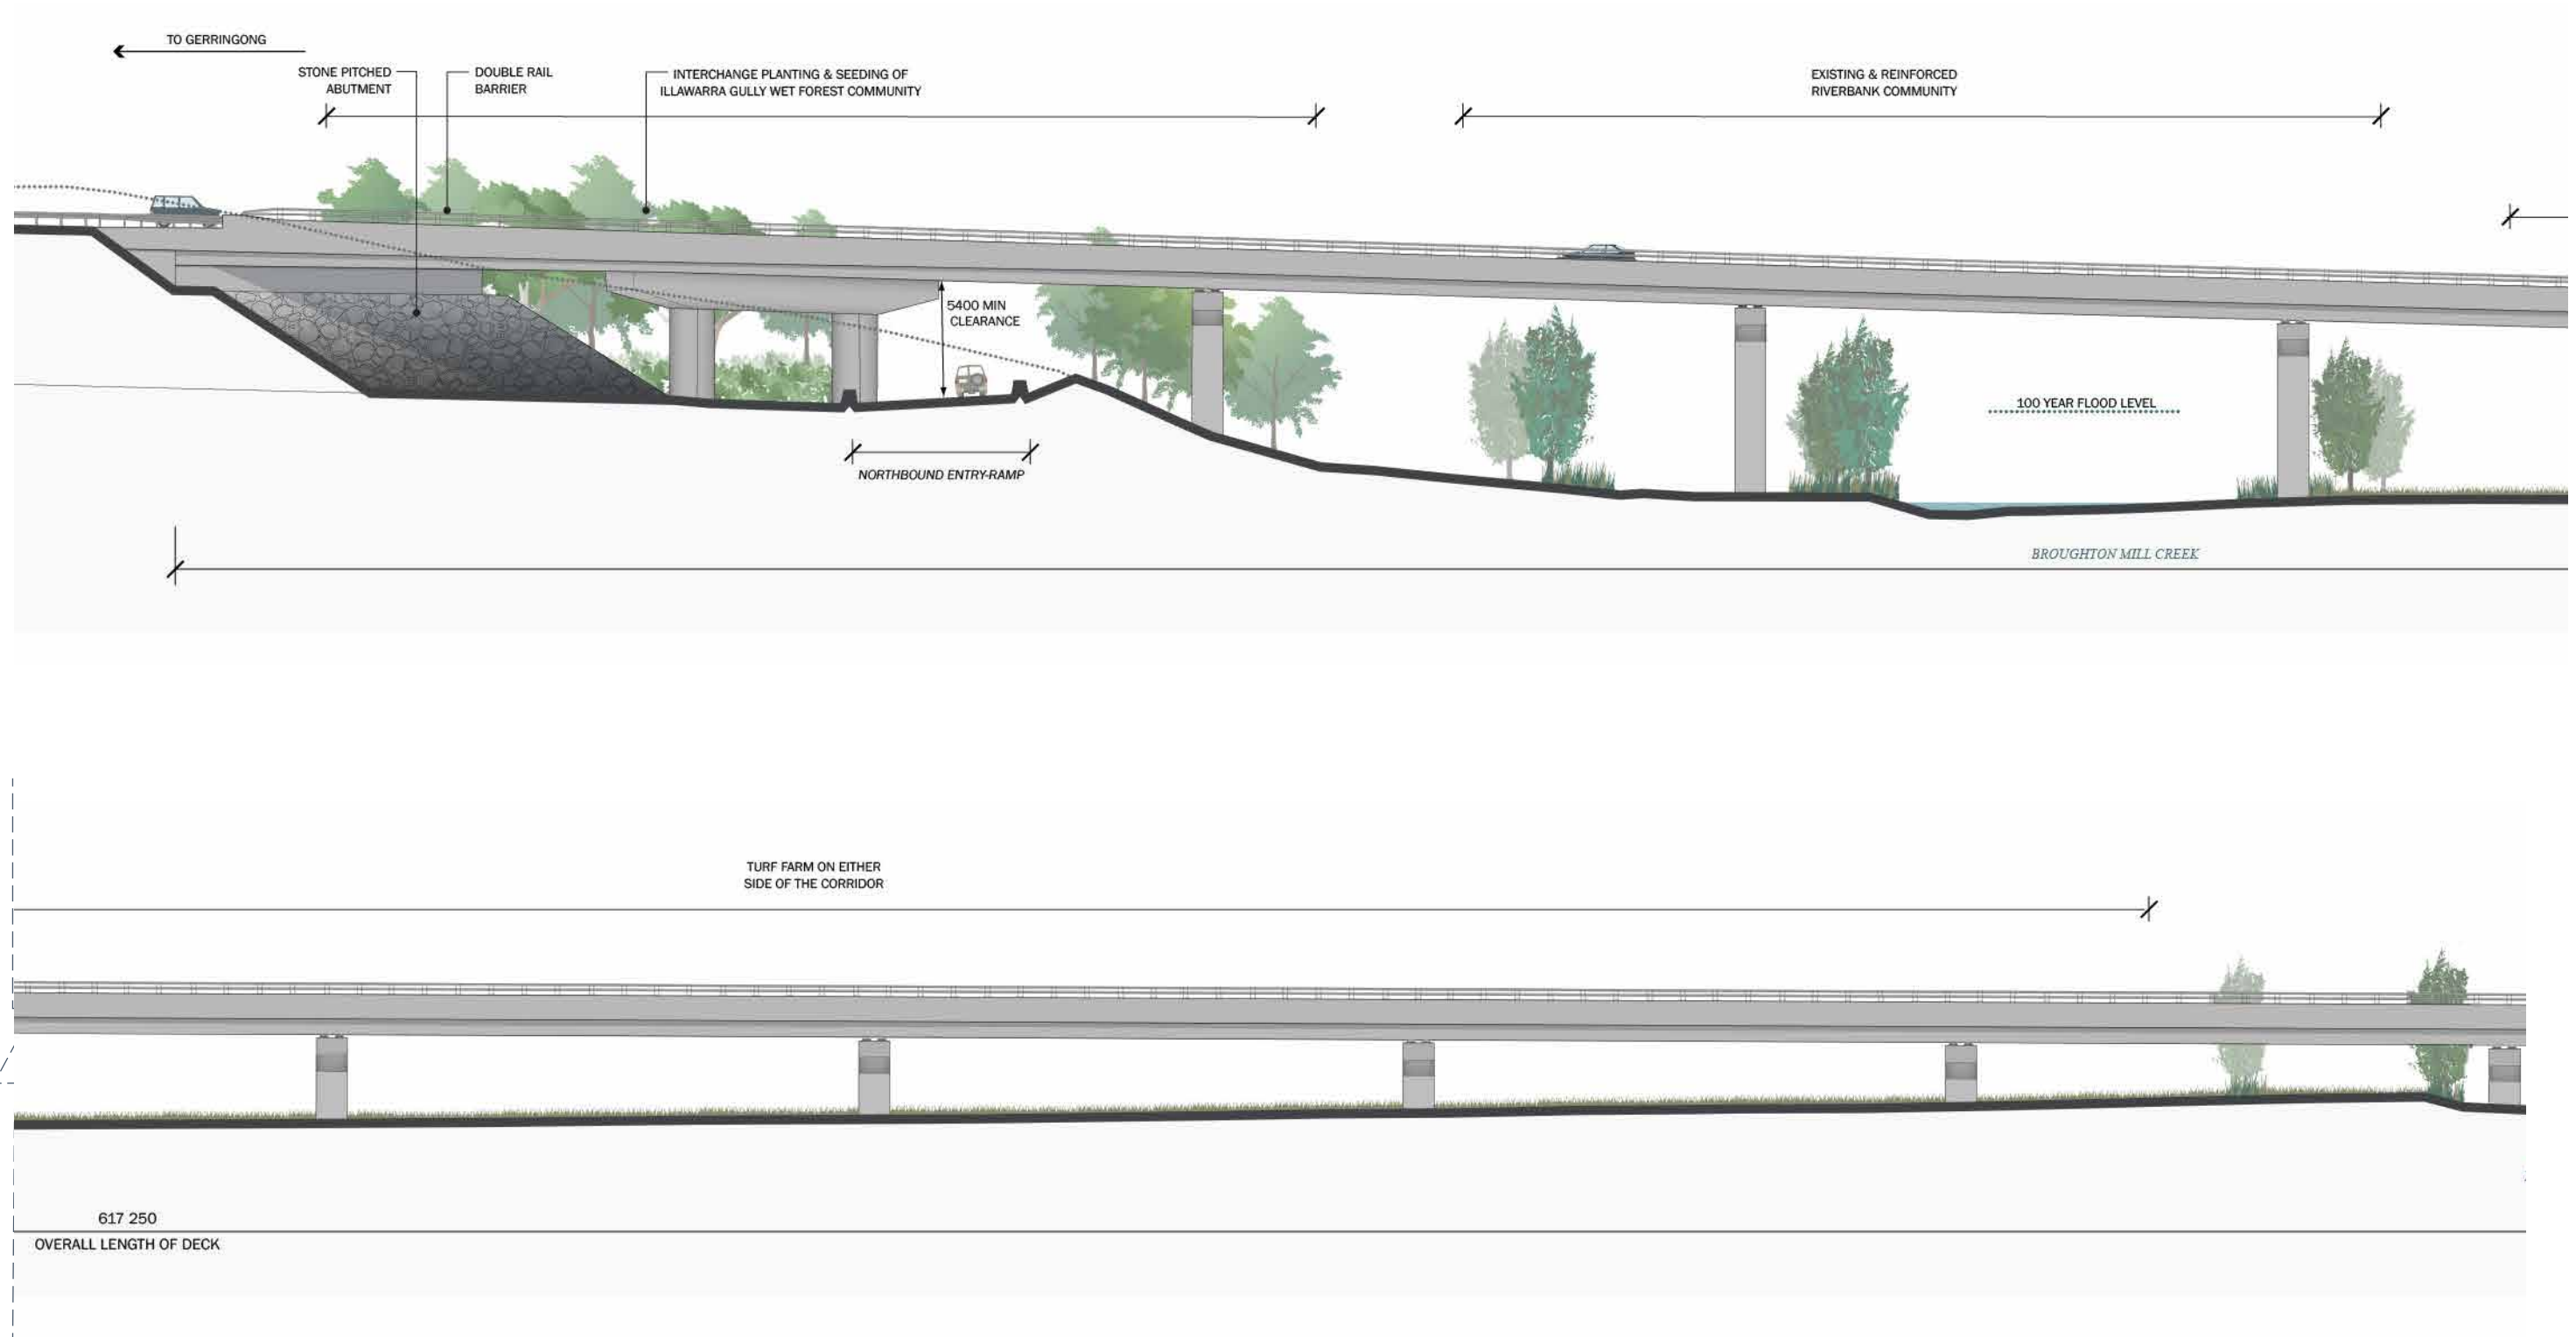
Elevation – Bridge SB07: Berry Bridge (Scale: 1:400@A3)
